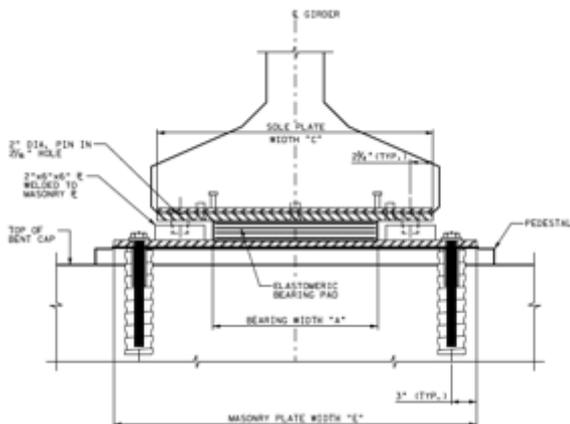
Typical detail of elastomeric bearings with restraints as used in railway bridges
